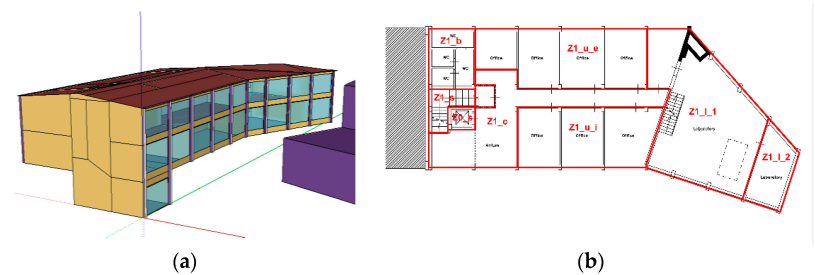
Case study building: (a) energy model; (b) standard floor plan
